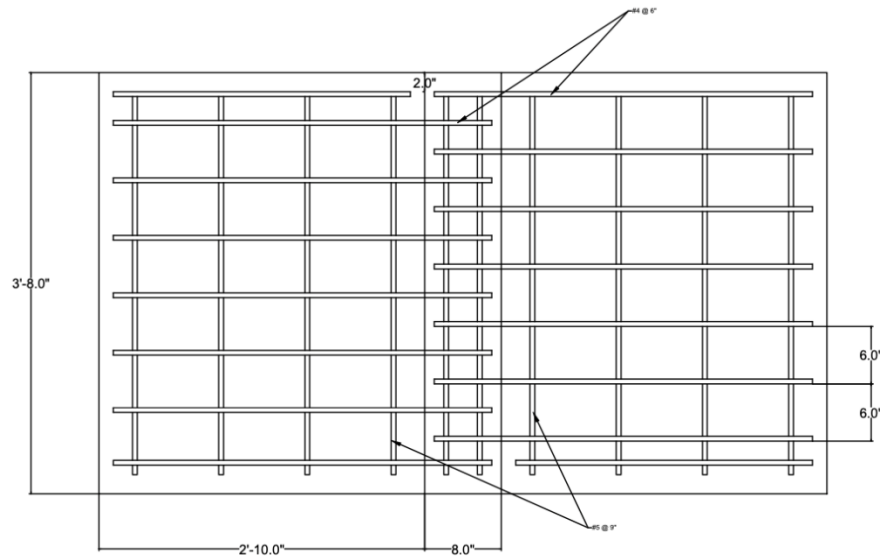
Plan view of test specimen 1 (8 in. closure gap)
